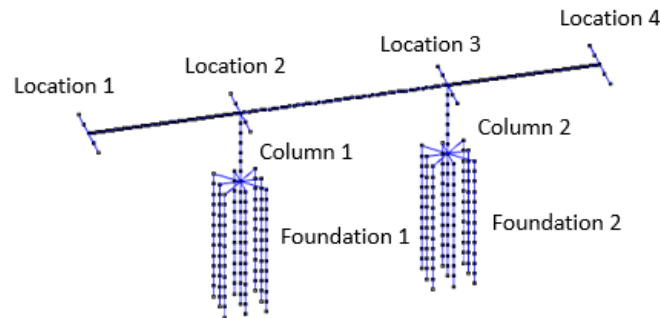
Finite element model of the MSC concrete girder bridge in OpenSees
